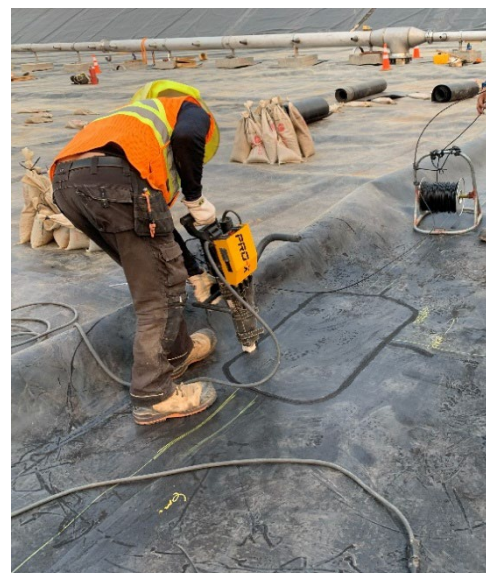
Extrusion Fillet T-Seam - LLDPE
